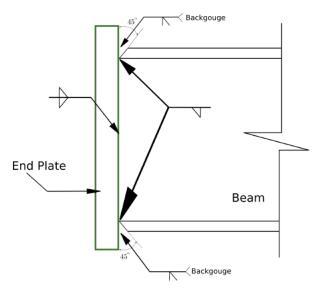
Typical Weld Details -- Beam to End Plate Connection
